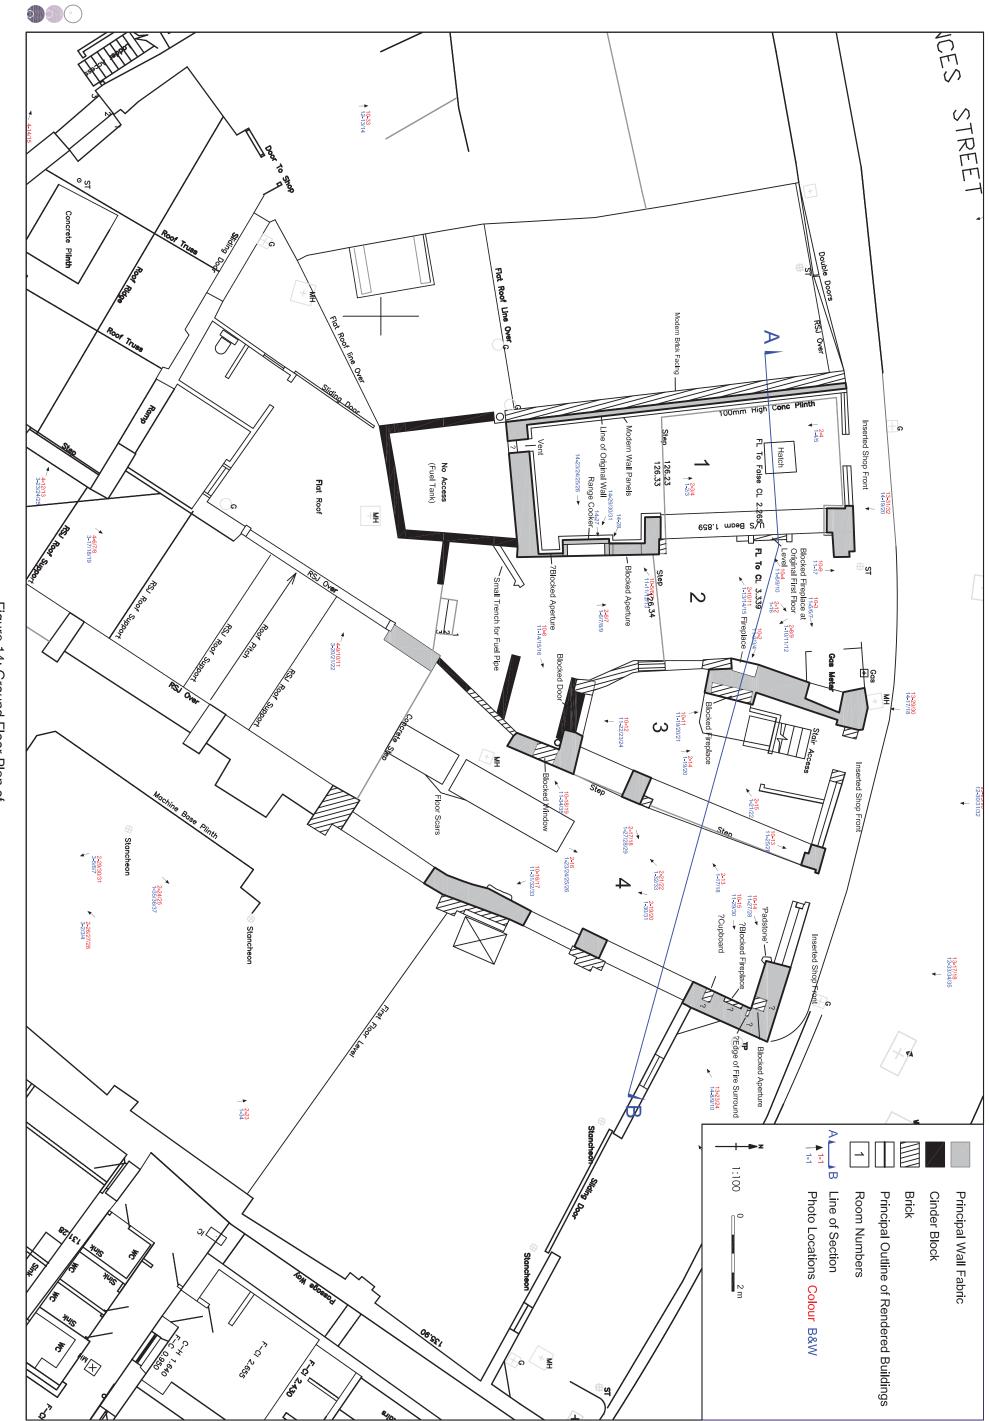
Ground Floor Plan of Numbers 9-12 Princes Street
